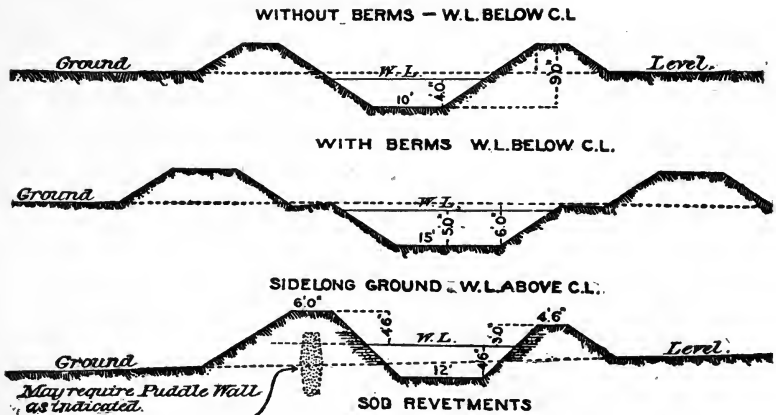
VARIOUS CANAL CROSS-SECTIONS.
